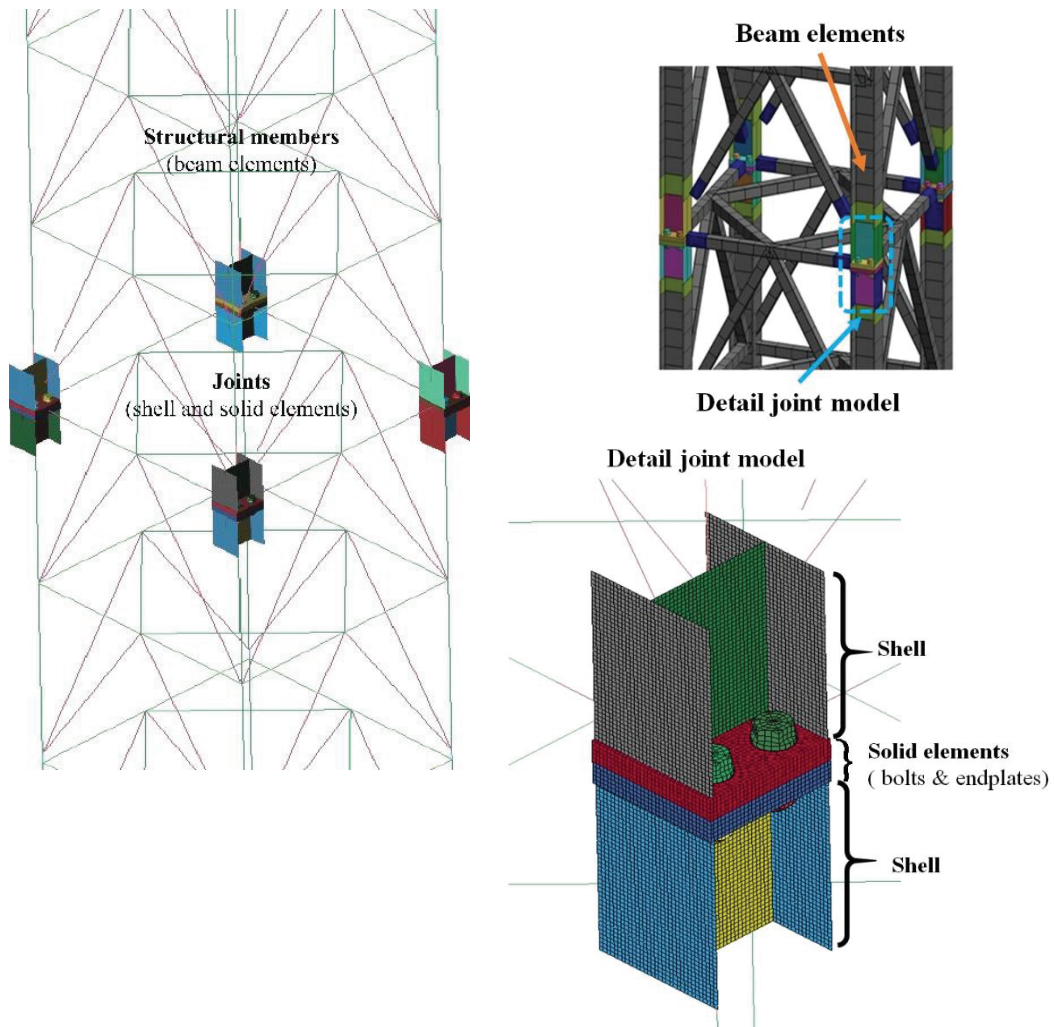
Modeling of the tower crane mast (three-dimensional truss and site end-plate-type tensile bolted joint)
